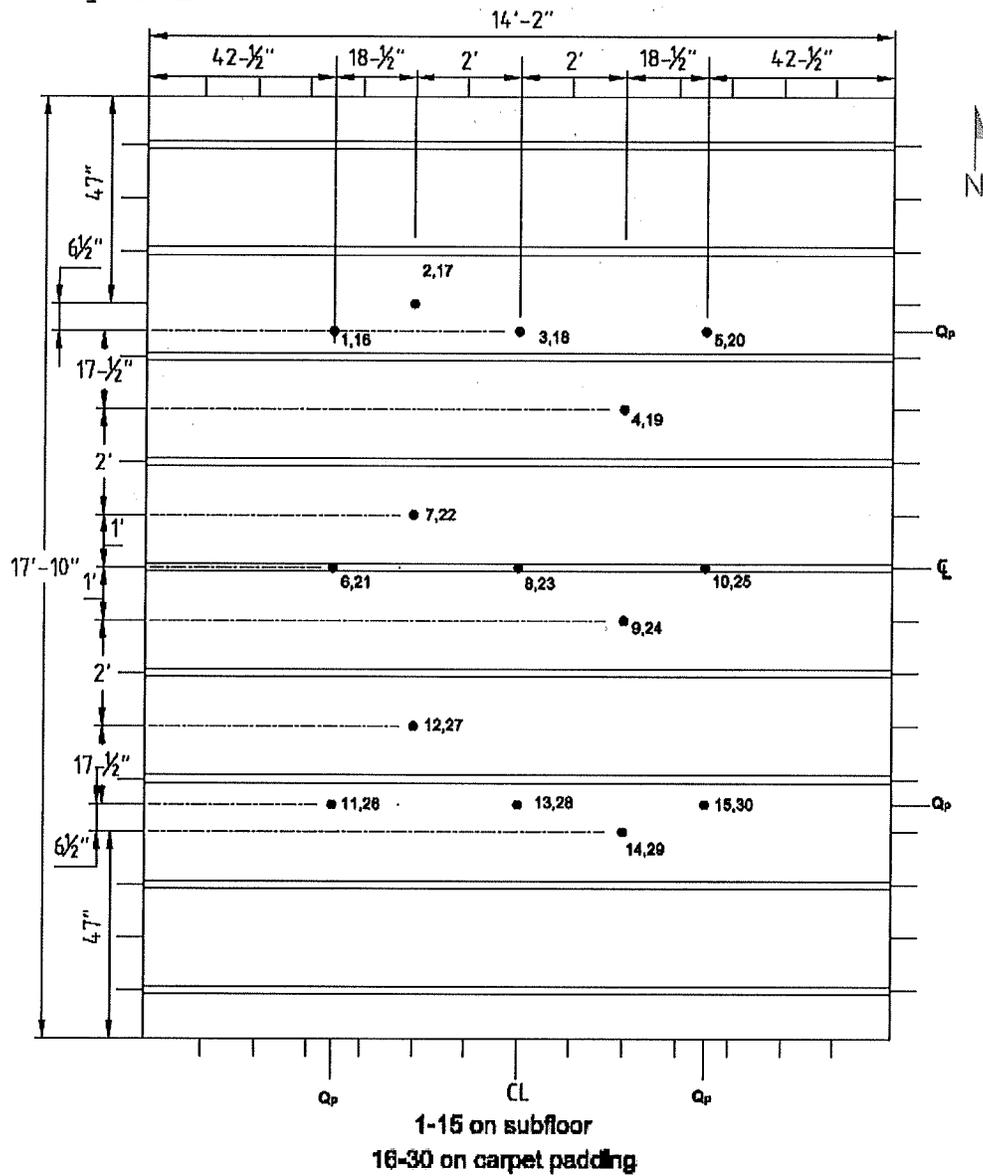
Thermocouple Locations on Subfloor and Carpet Padding.
